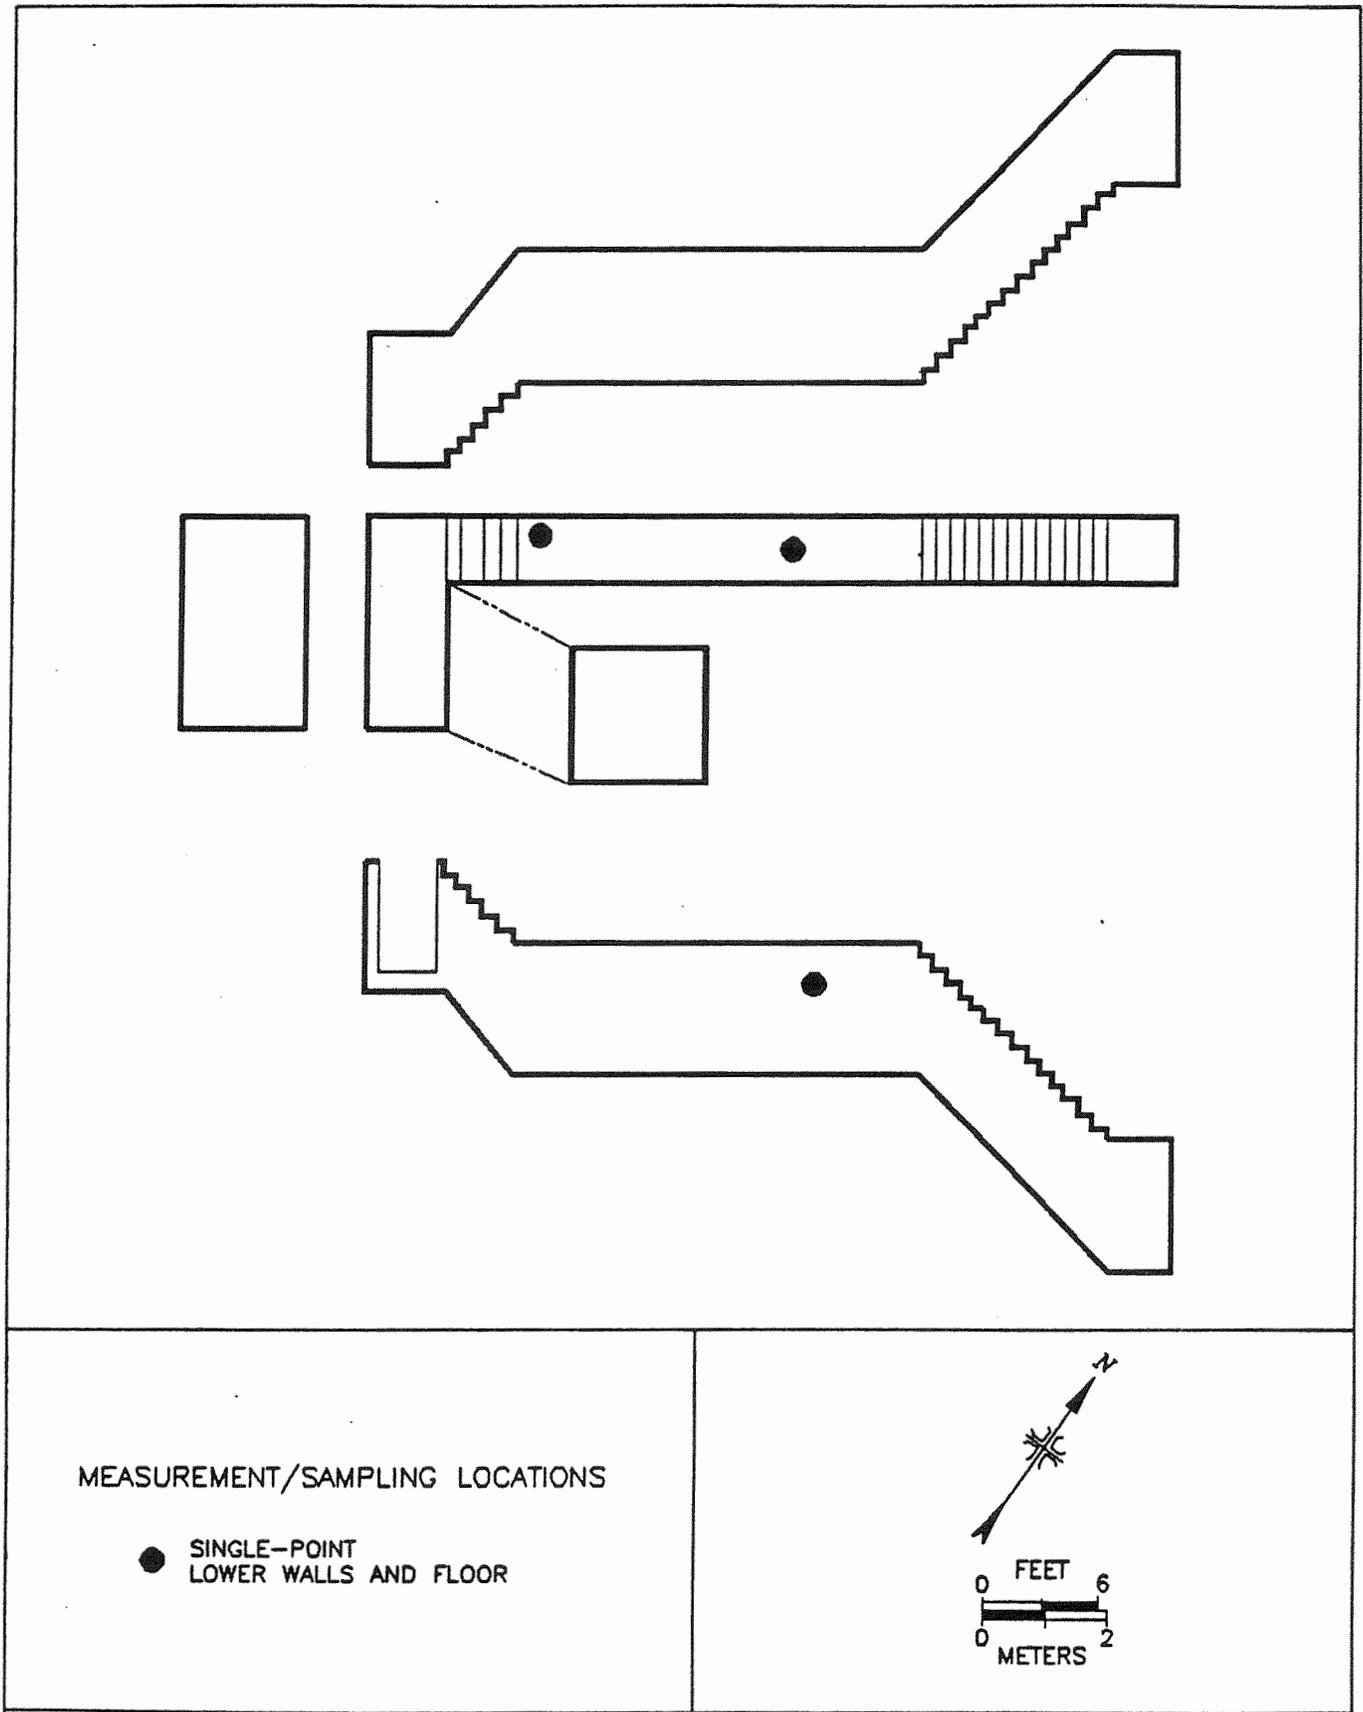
Building T028 Stairwell – Measurement and Sampling Locations
